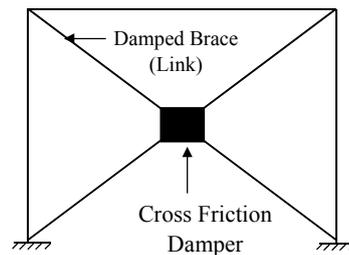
Tension Only Cross Brace with Pall Friction Damper
